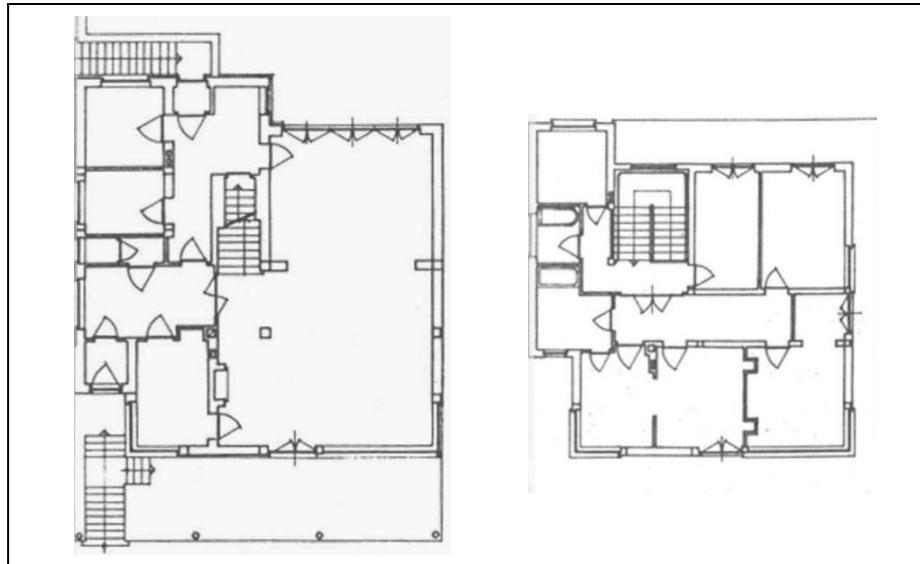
Floor plans of Ragıp Devres villa's [63]
